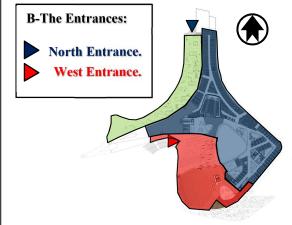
QFIS Ground Floor Plan-http://alfozanaward.org
